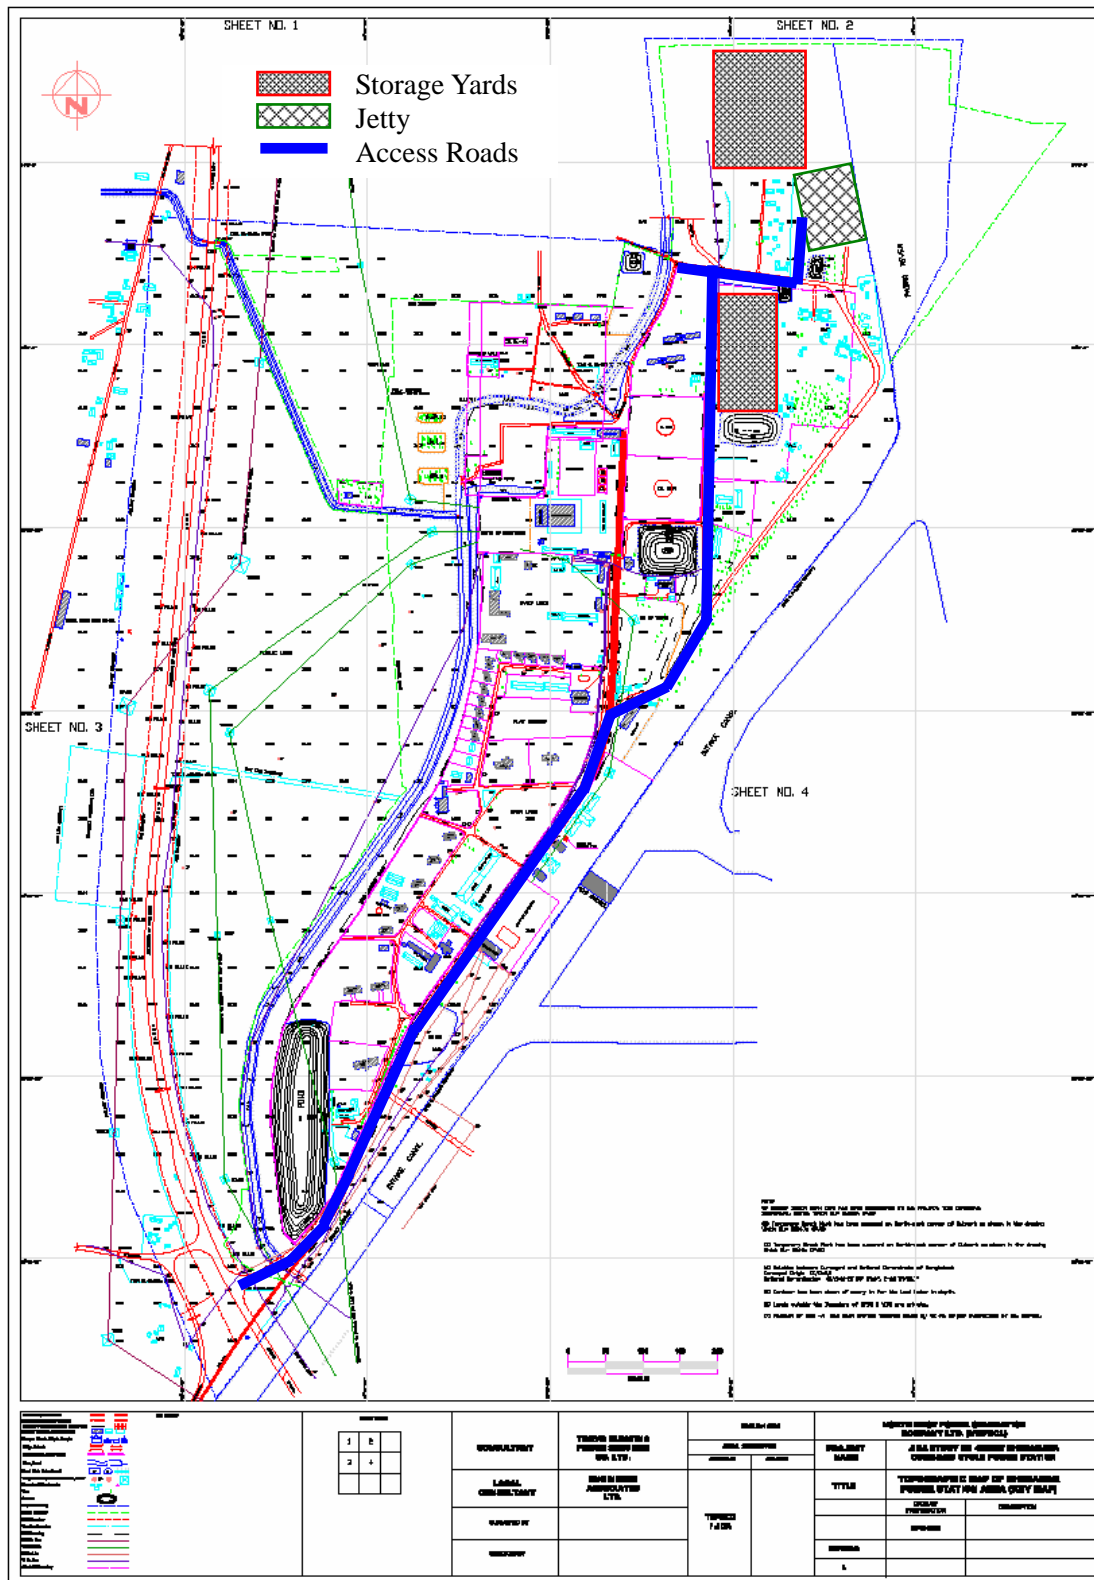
Layout plan of jetty, storage yard and access road
